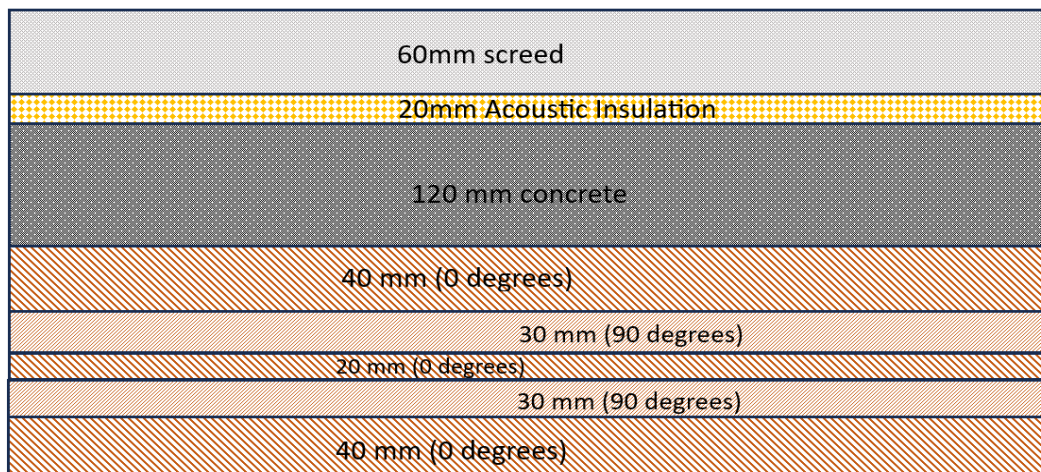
Fifth floor level floorplate hybrid floor panel buildup.
